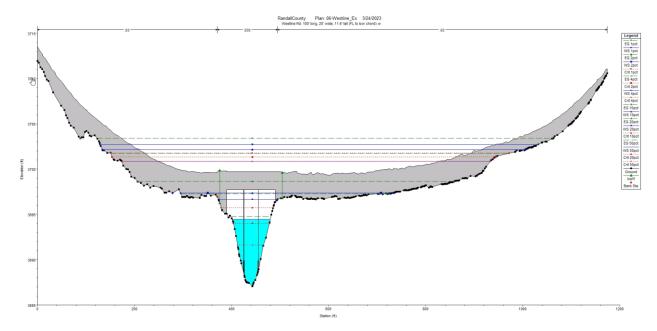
Upstream cross section at Westline Road crossing of Palo Duro Creek.
